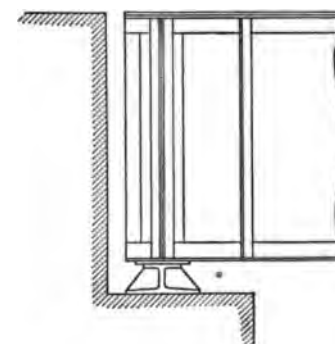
(b). Cast Pedestal for Bridge Girder.
